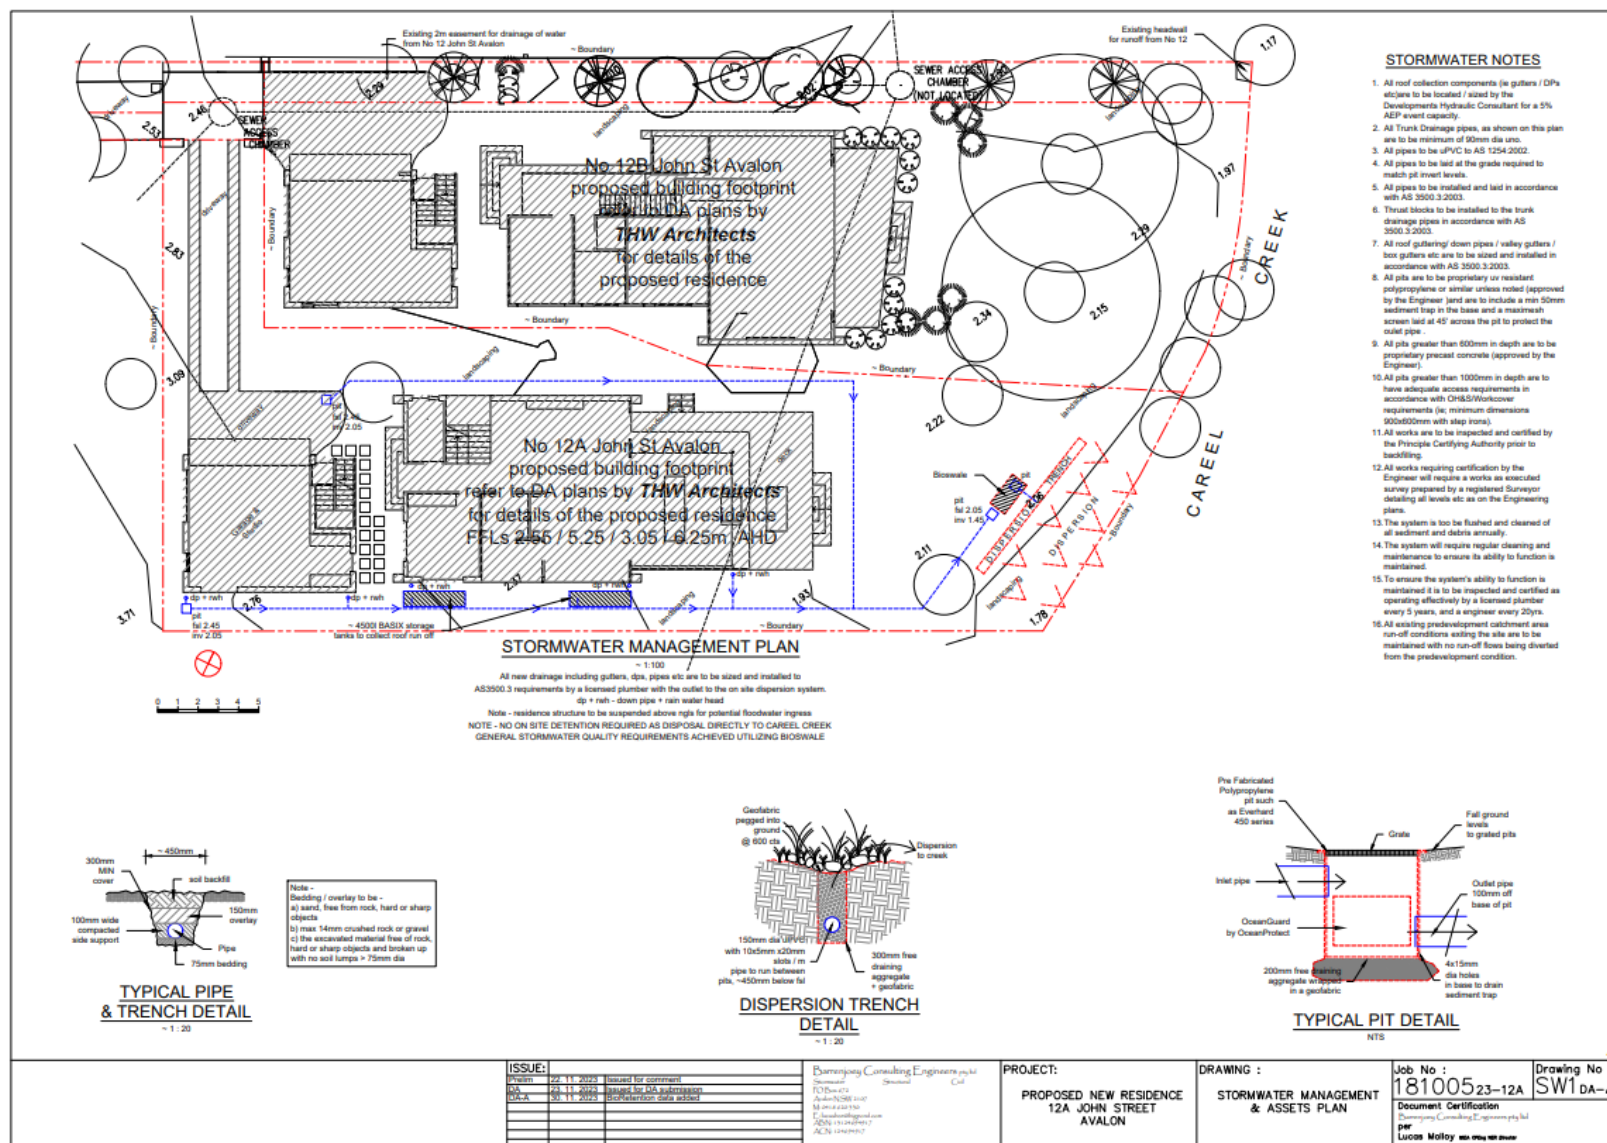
Stormwater Management & Assets Plan. Sheet 1 of 2. Source: Barrenjoey Consulting Engineers Pty Ltd. 30.11.2023.
